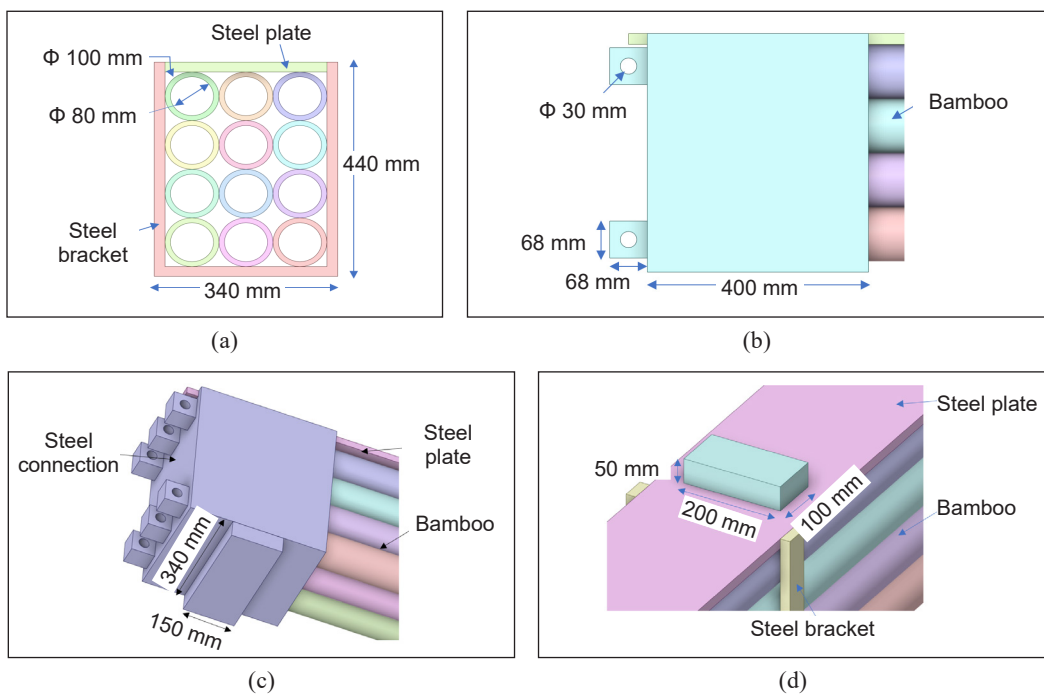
Parts dimensions: (a) cross-section of a bamboo bundle; (b) Steel connection; (c) Support pad; and (d) Loading pad
